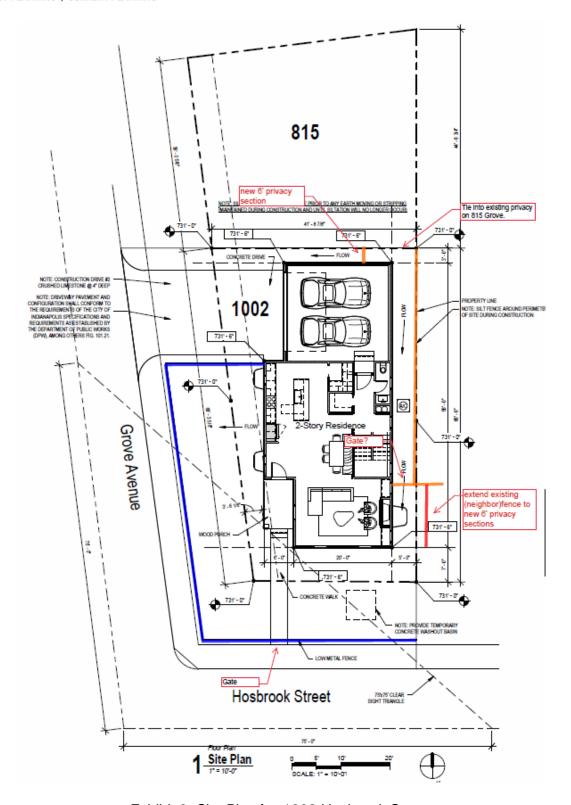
Site Plan for 1002 Hosbrook Street.
